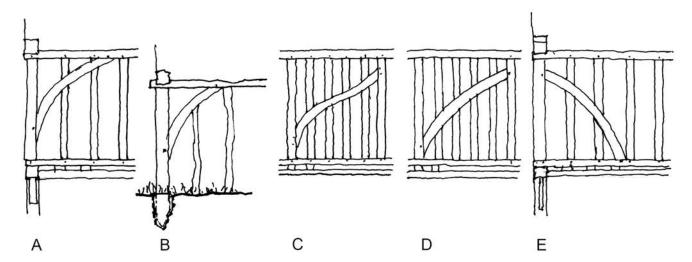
External wall bracing to triangulate and stiffen walls, with also decorative implications:
